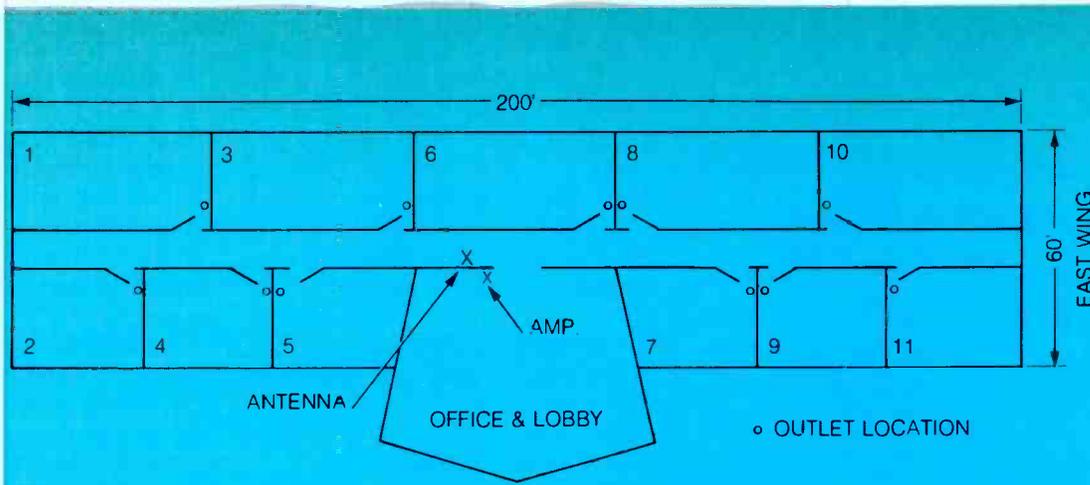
On a drawing of the floor plan, mark locations of TV outlet boxes, antenna, and head-end equipment.
